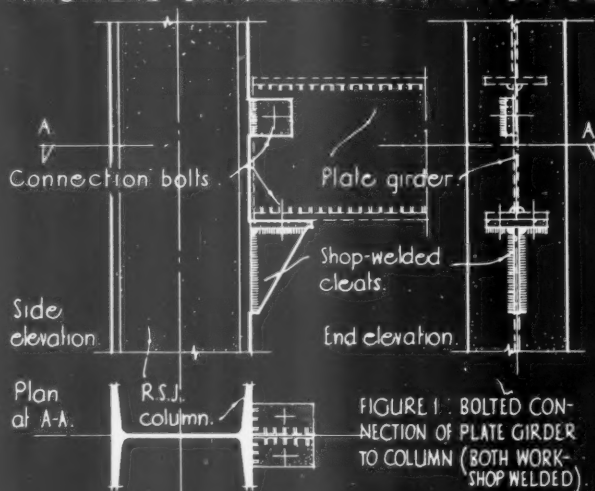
BOLTED CONNECTION OF PLATE GIRDER TO COLUMN (BOTH WORKSHOP WELDED)
